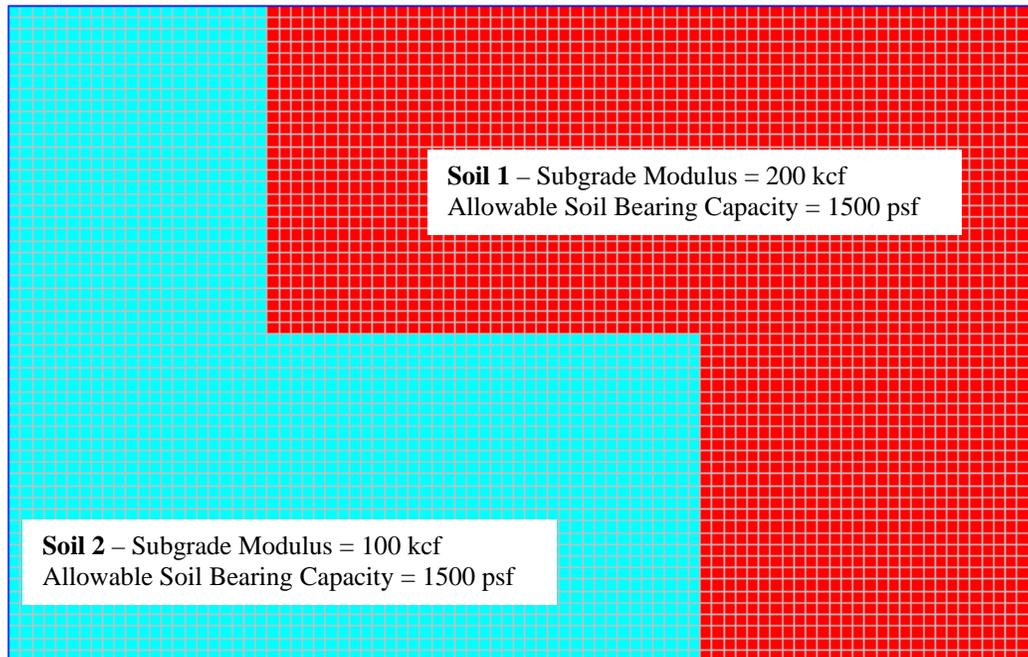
Plan View of Mat Foundation Slab with Dissimilar Soils
